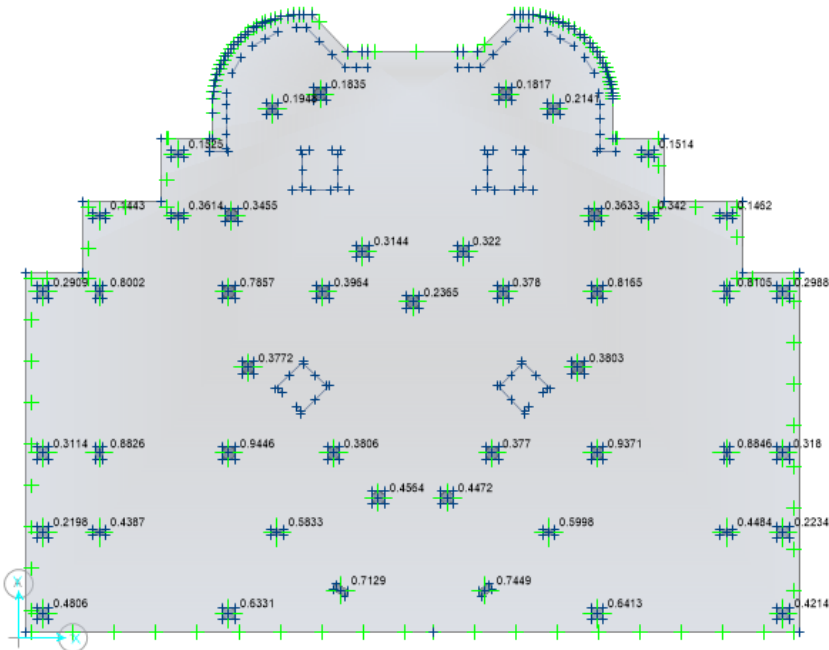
Punching Shear Capacity Ratios / Shear Reinforcement for mat foundation
